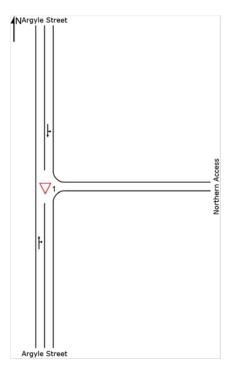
Northern Access and Argyle Street Intersection – Existing Layout
